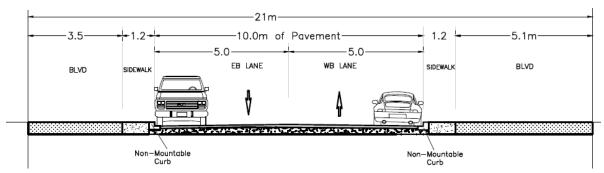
TYPICAL EXISTING CROSS SECTION FOR GRAHAM RD AND GALLOWAY DR
